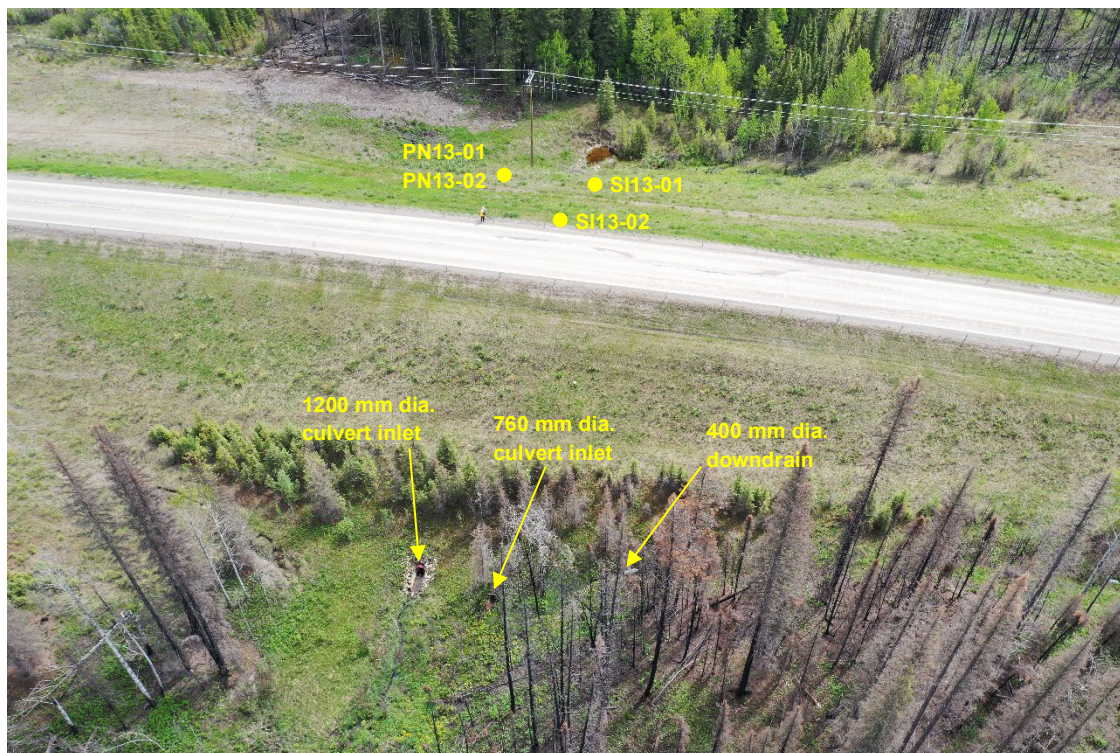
Overview of west side of site. Photo taken by drone, looking east.
